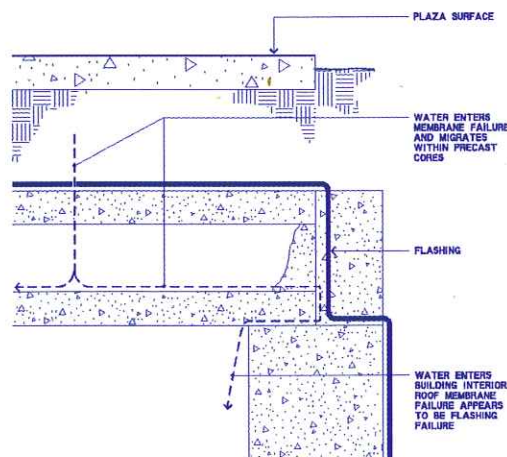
Membrane failure resembles a flashing failure.
